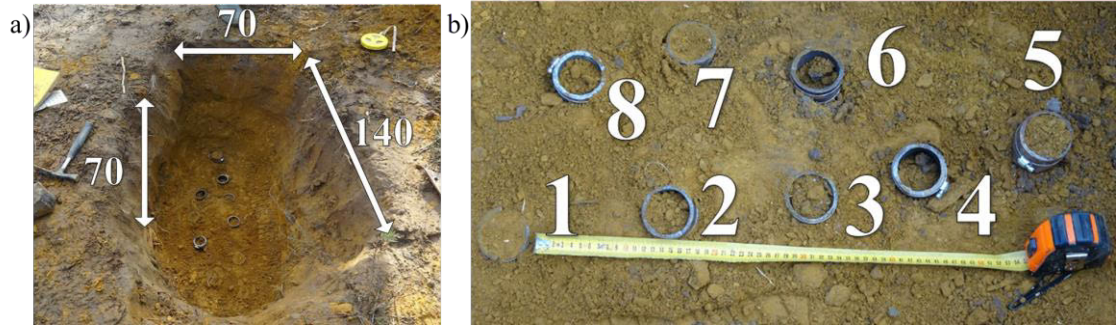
S4_SBM_22 excavation: a) dimensions, b) samples.
